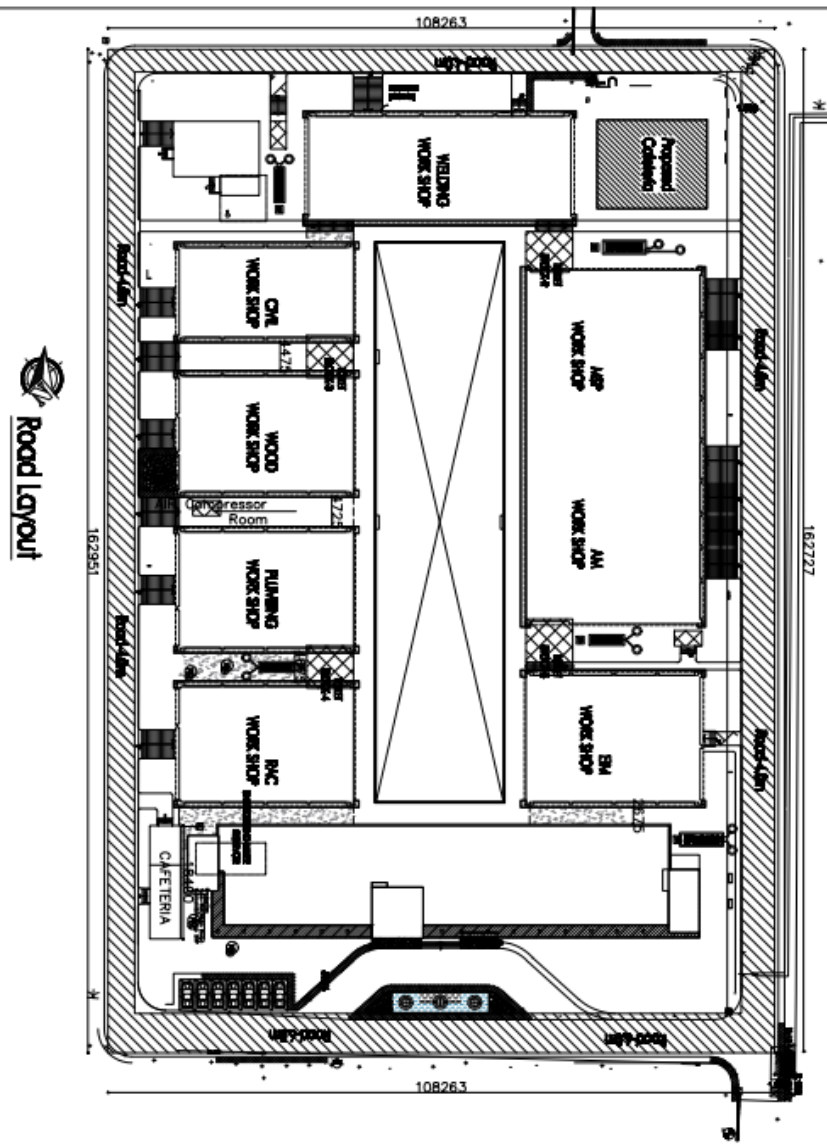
Layout of Proposed Road and Tin Shed Cafeteria
